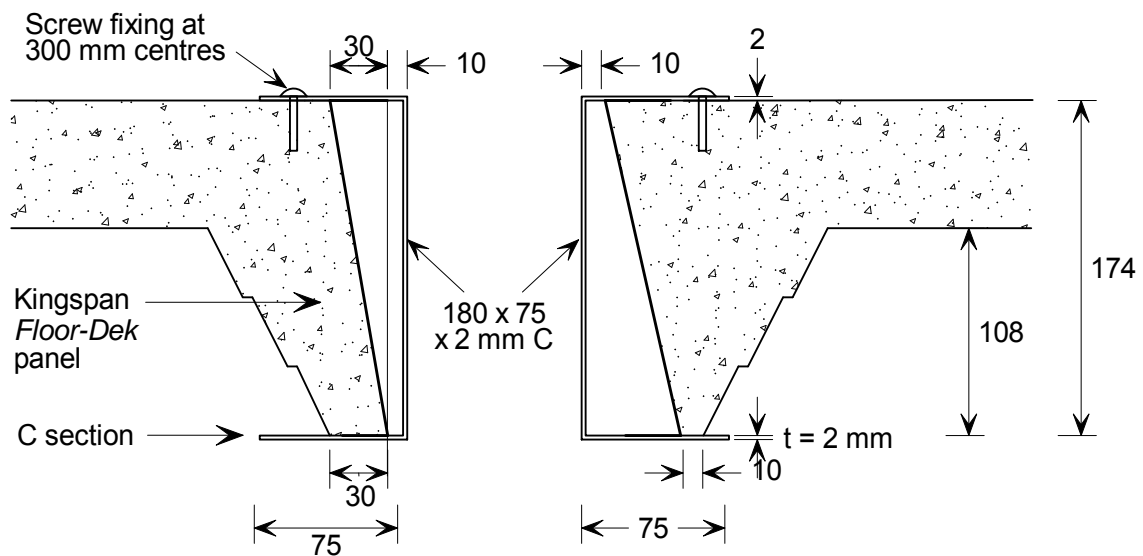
C sections acting as a slim floor beam to support edge of *Floor-Dek* over openings
